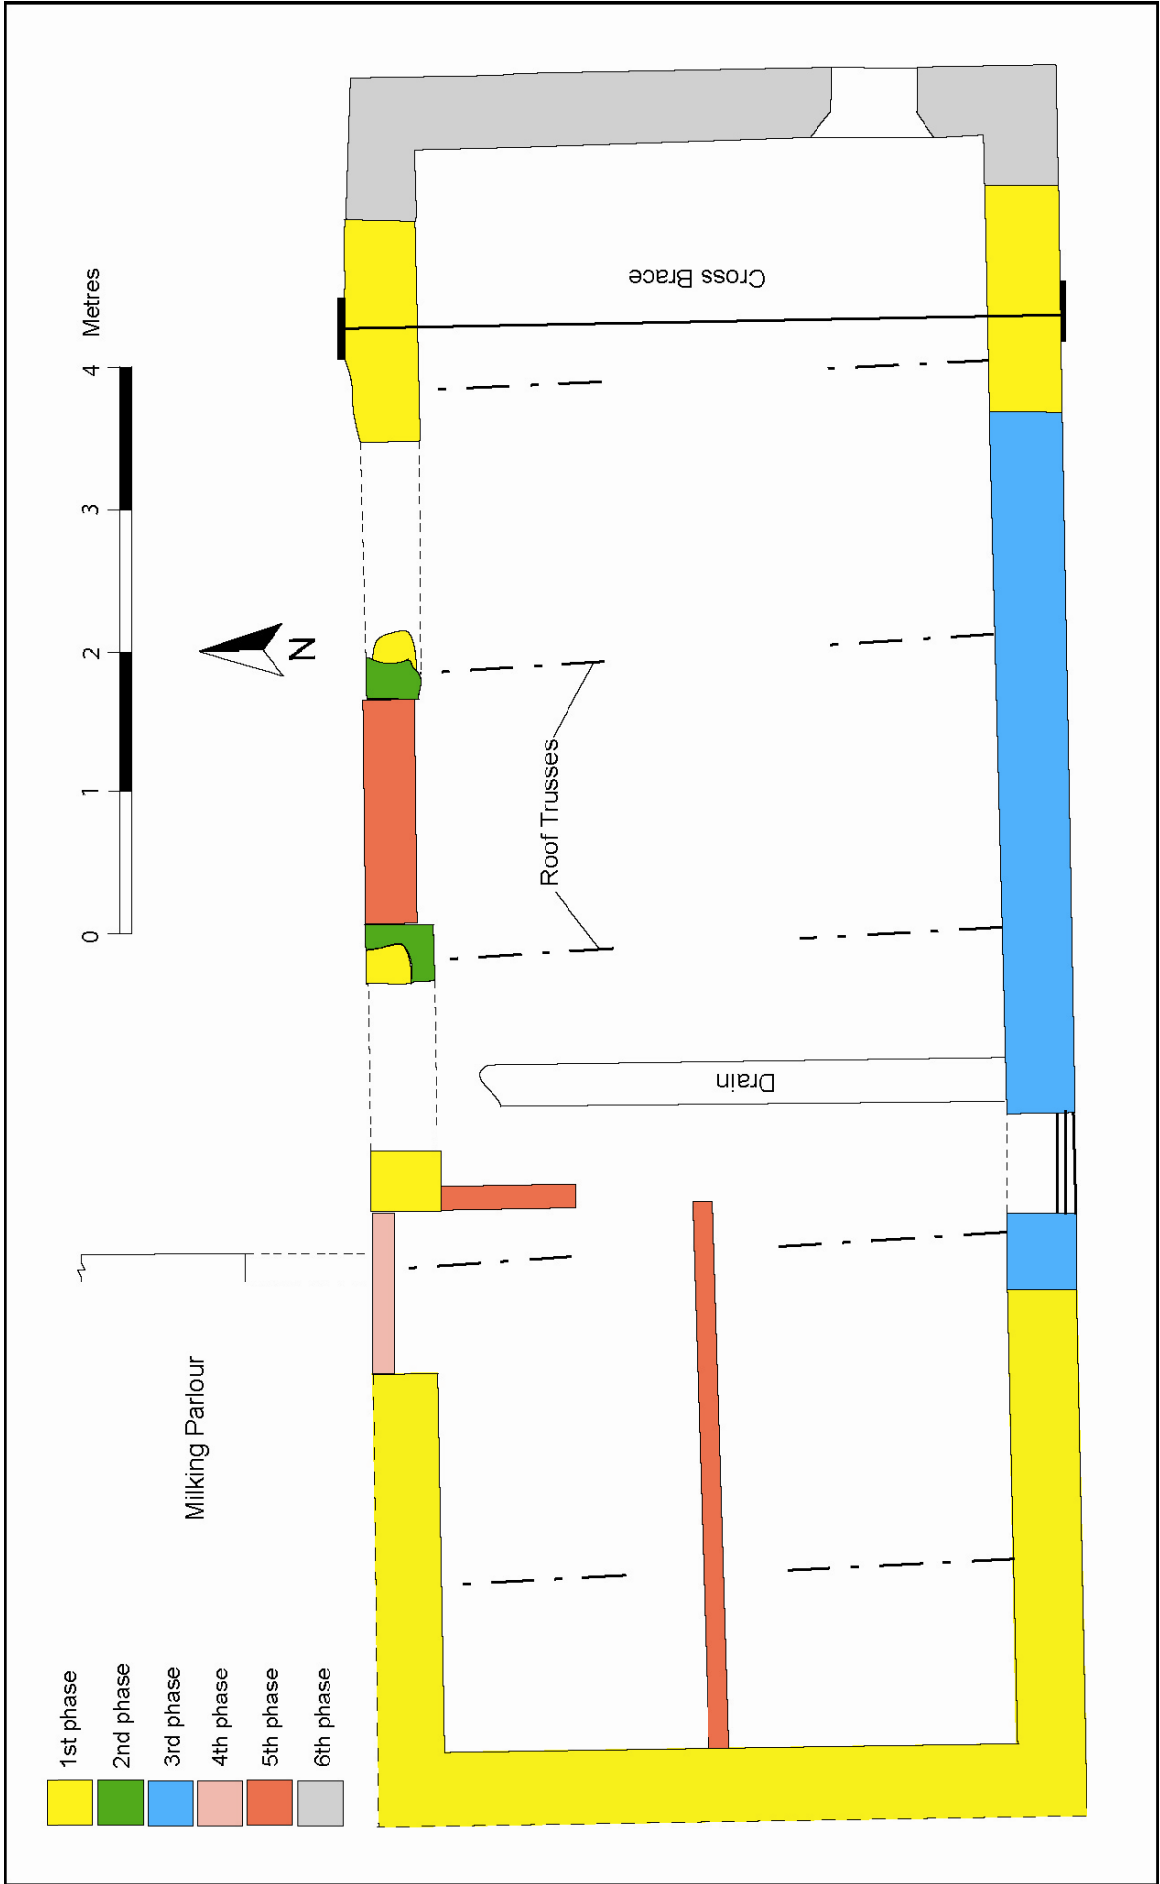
Phased ground floor plan of the barn (scale 1:50 @ A4).
